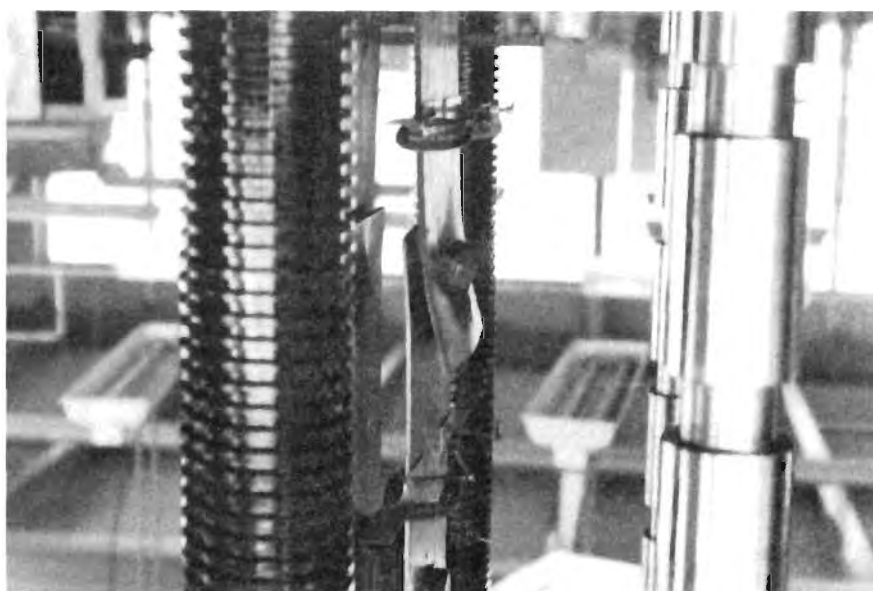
Photographs of the Typical Failure Modes due to Excessive Bolt Rotation and Dishing of Steel Sheets
